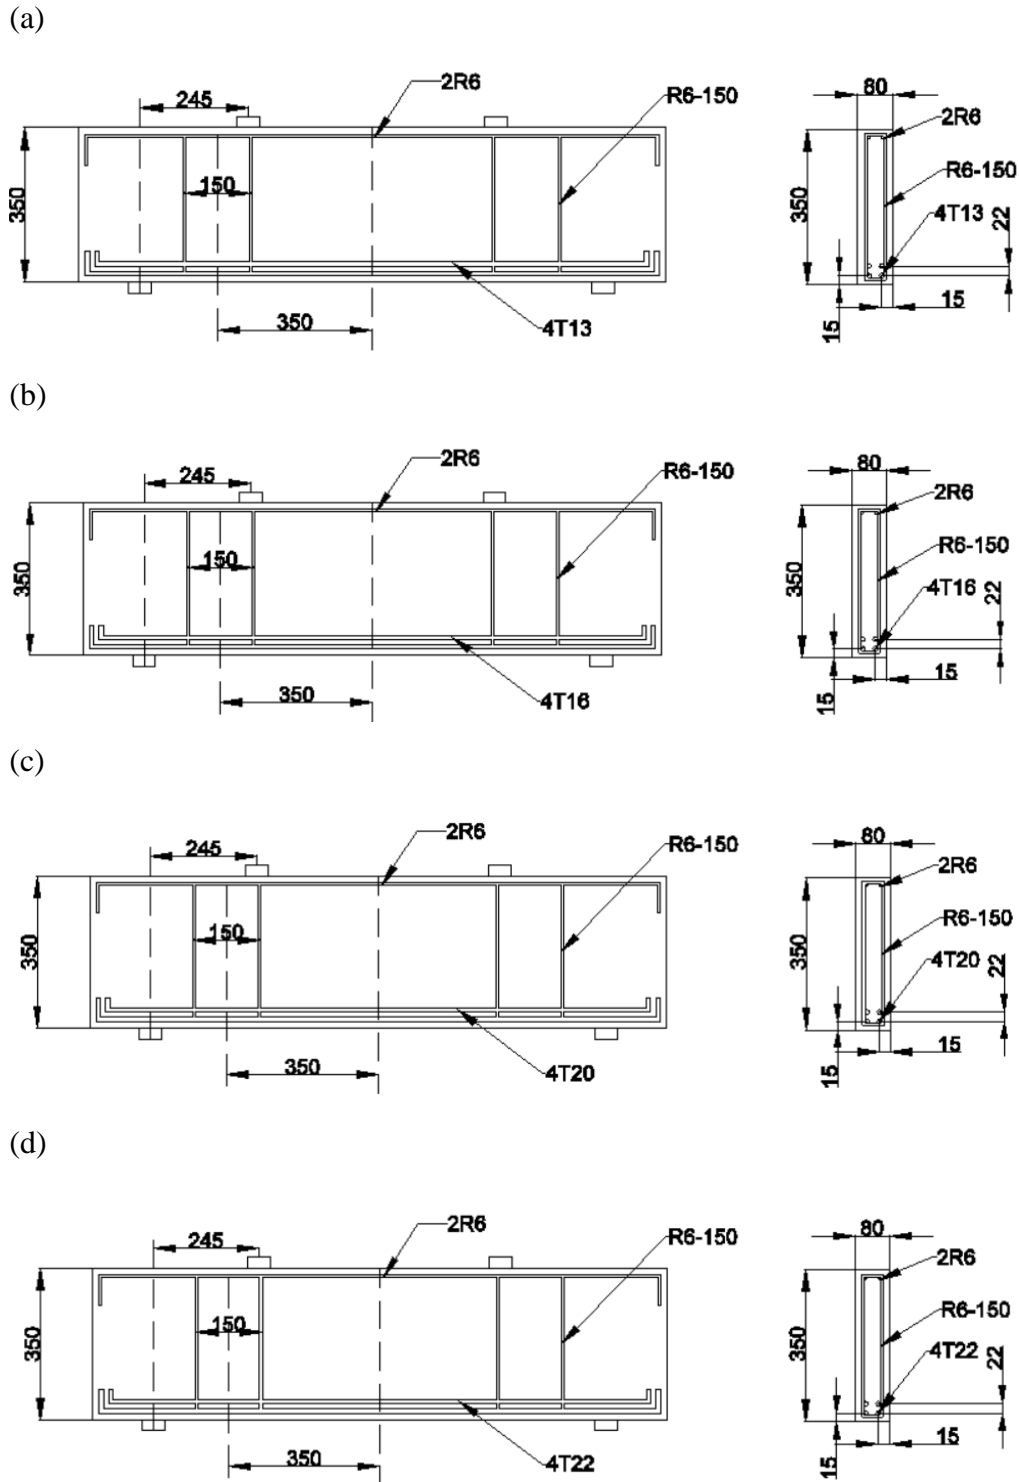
Detailing for Test Beams for Batch 2: Longitudinal Reinforcement Diameter (a: SLR-T13; b: SLR-T16; c: SLR-T20; d: SLR-T22)
